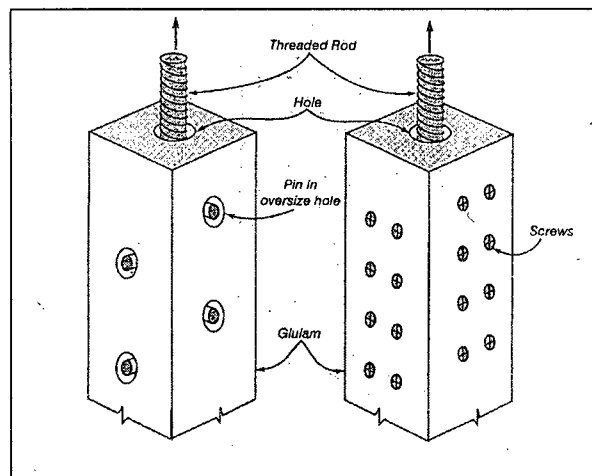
Sketch of test specimens (before grouting) (Buchanan)
